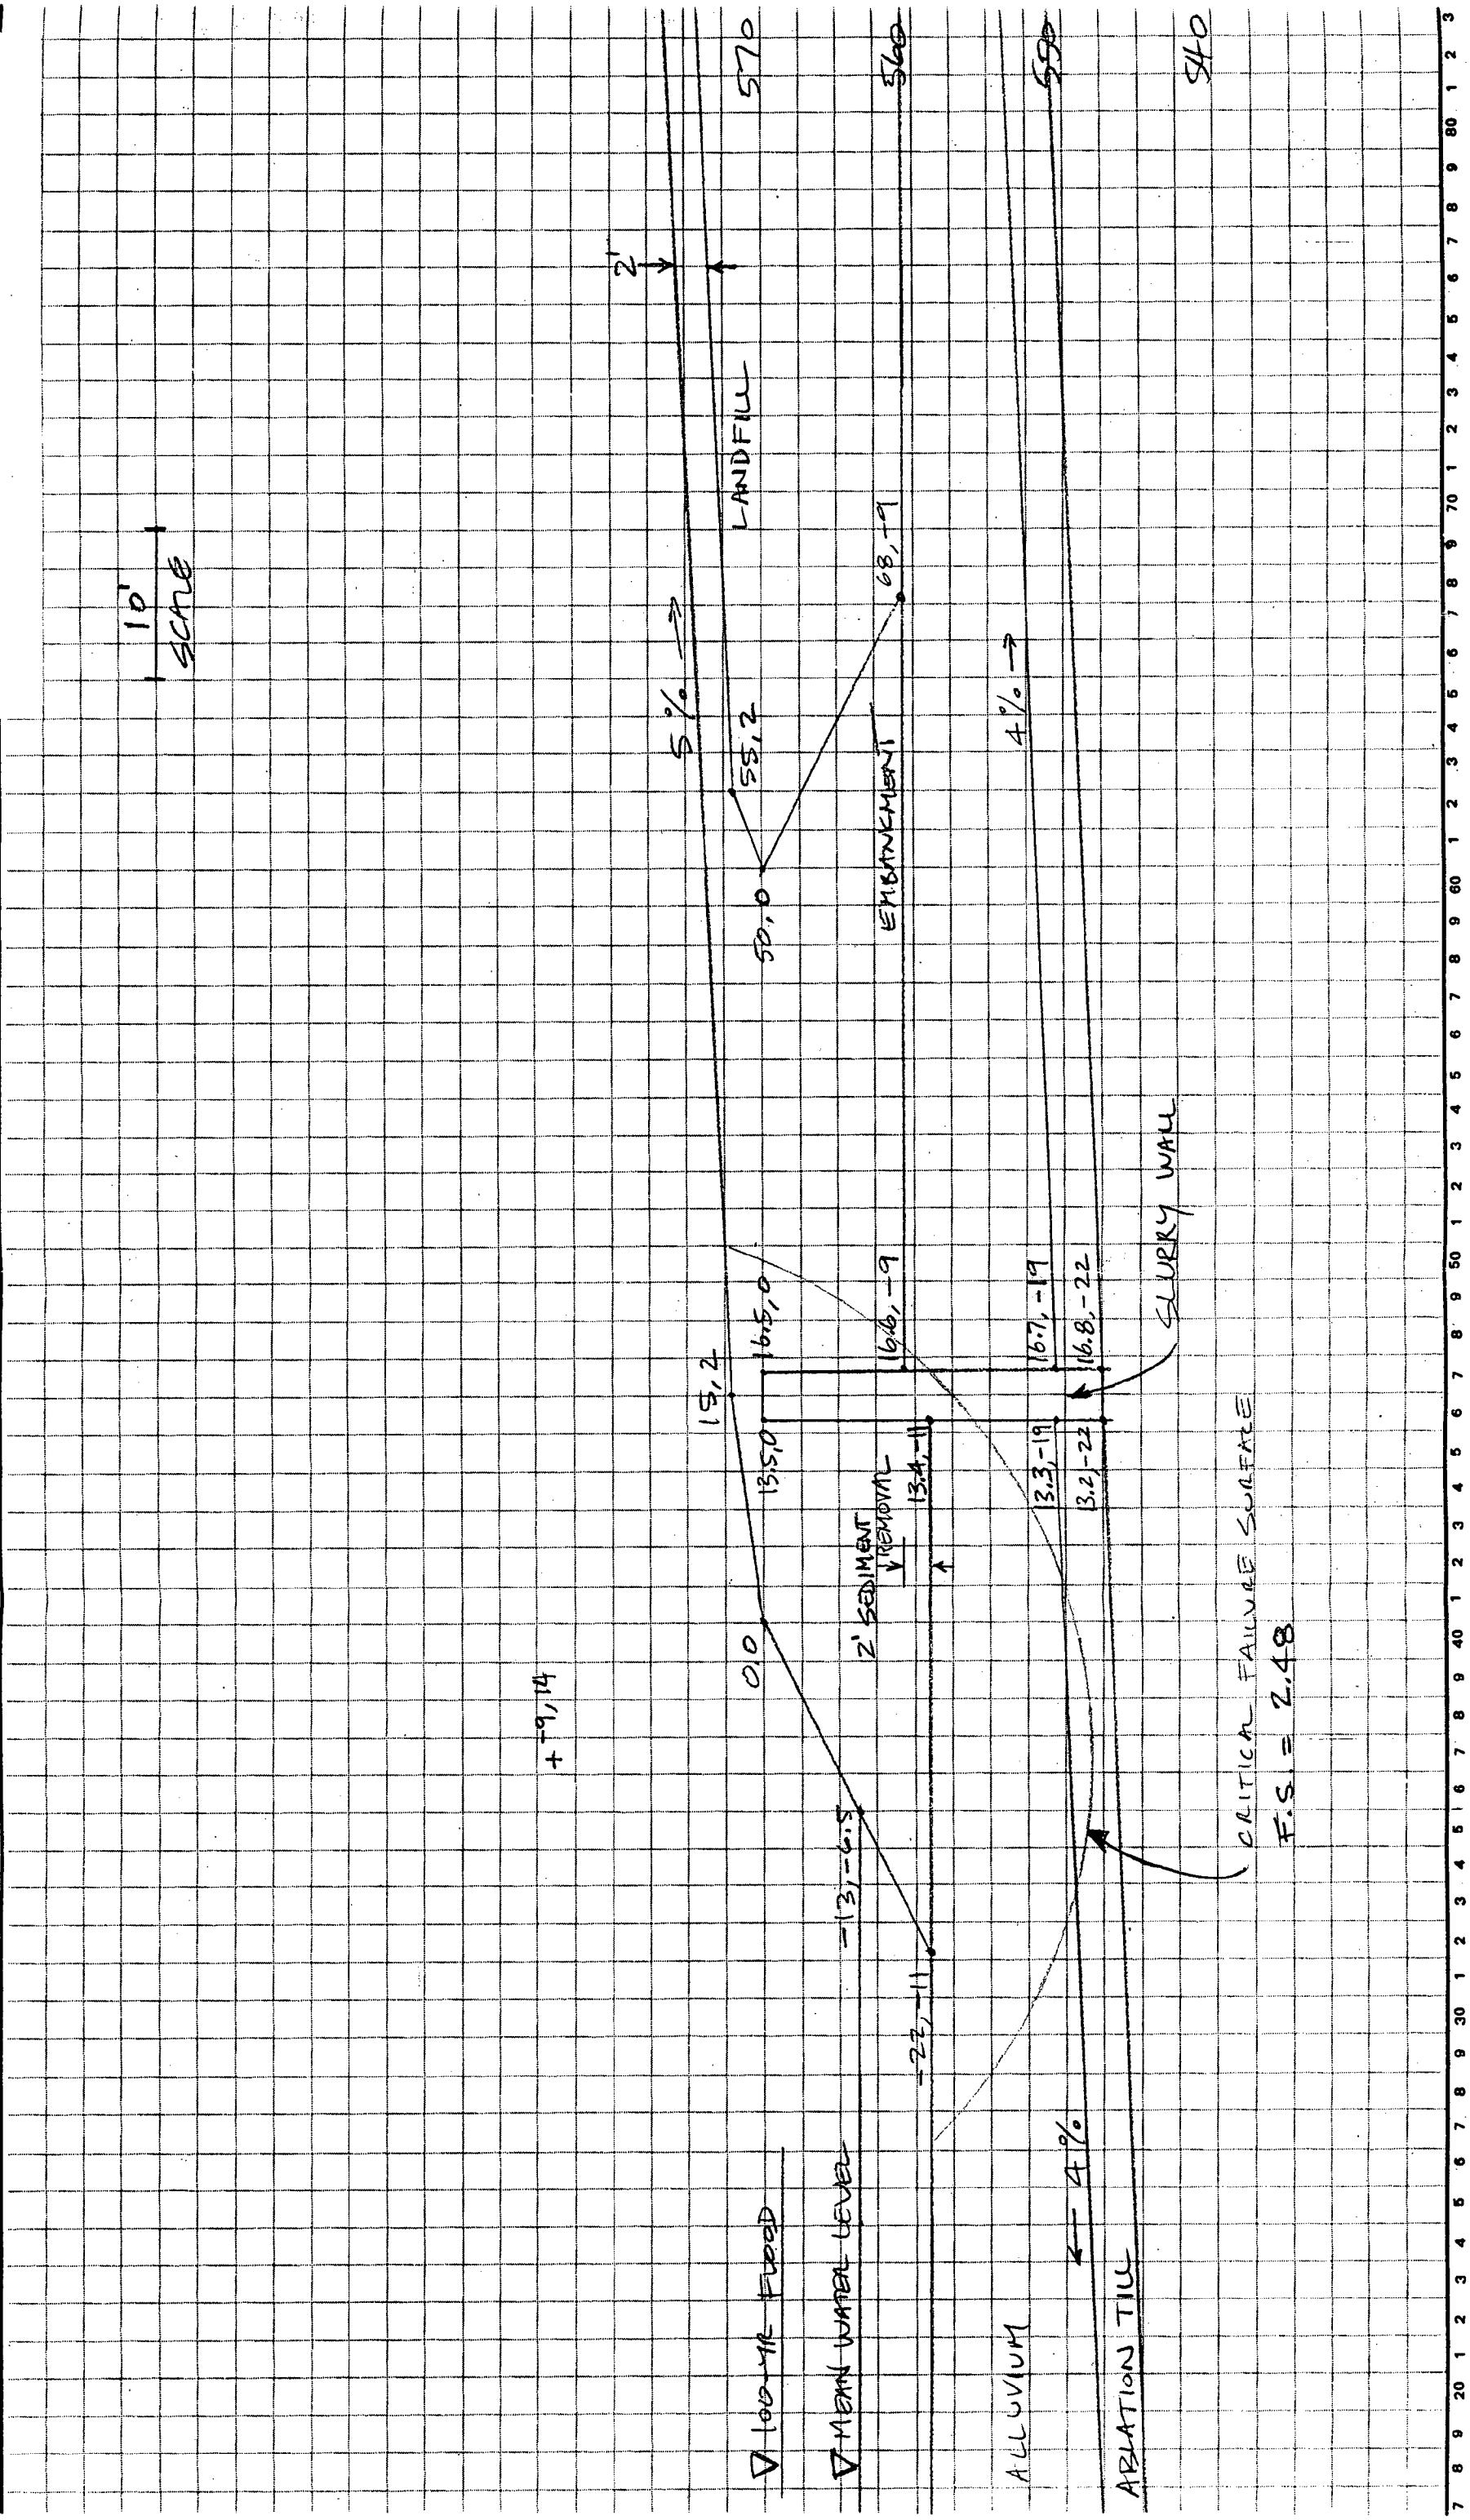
BULKHEAD, OLIN PROPERTY, CROSS SECTION No. 1
